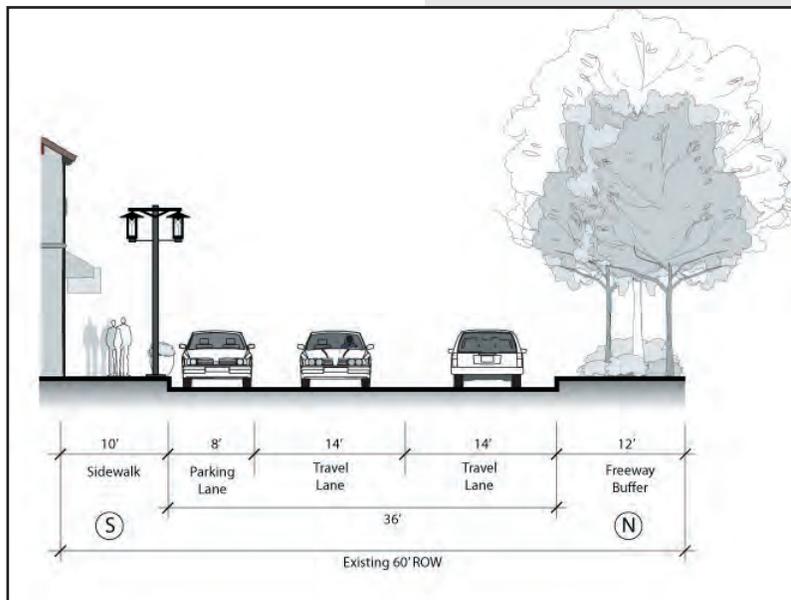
Future Roadside Drive street section (at Whizen Center)
